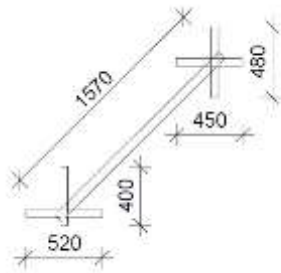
Dimensions and layout of the AFRP sheets – TFM- [7]
